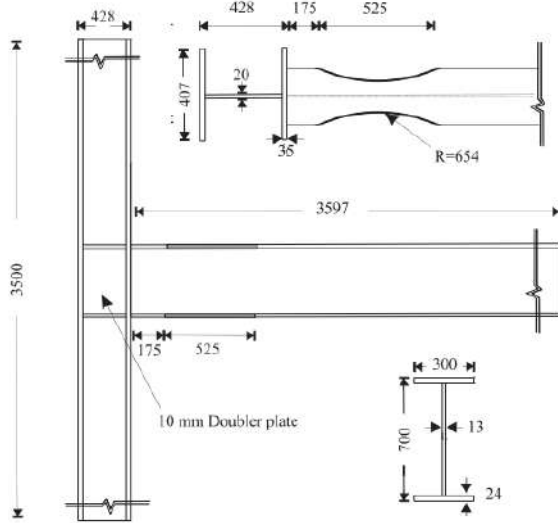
Specimen DB700-SW tested by lee et al(units in mm) [46,47]
